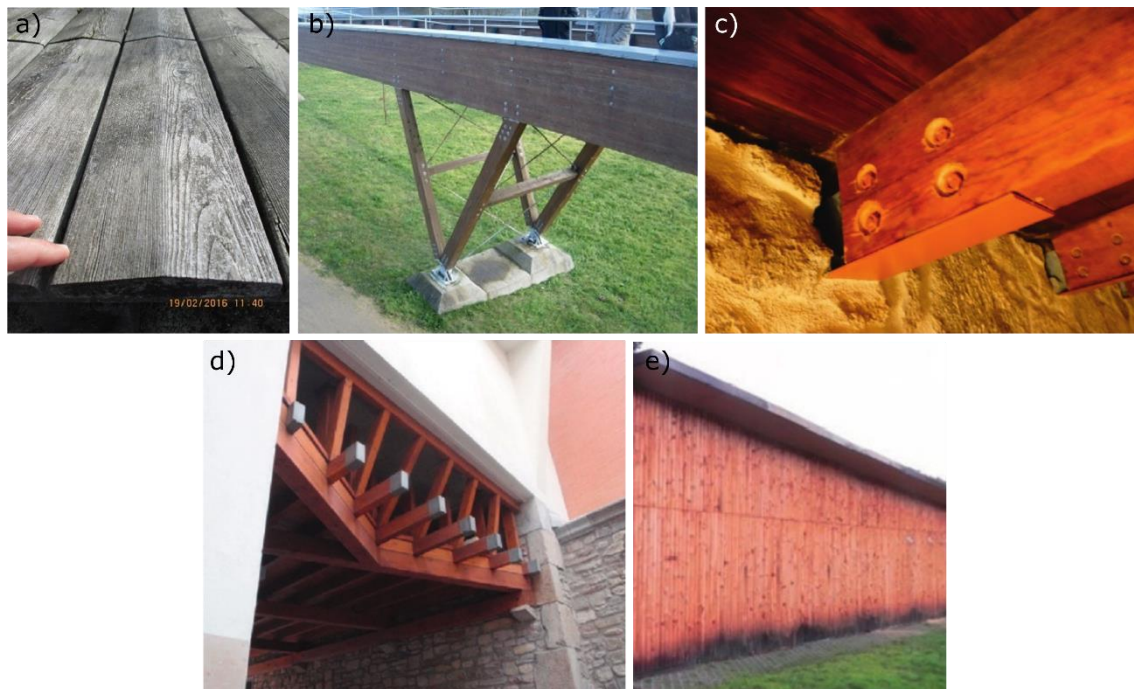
a) Decking with space between boards to avoid water accumulation, b) load-bearing pillars of wooden pedestrian bridge separated from the ground by concrete fundaments, c) separation between wood beam and wet wall, d) metal covering of end grain of exterior beams and e) wetting of cladding due to splash water in absence of a gutter. Adapted from Jones and Brischke (2017).
